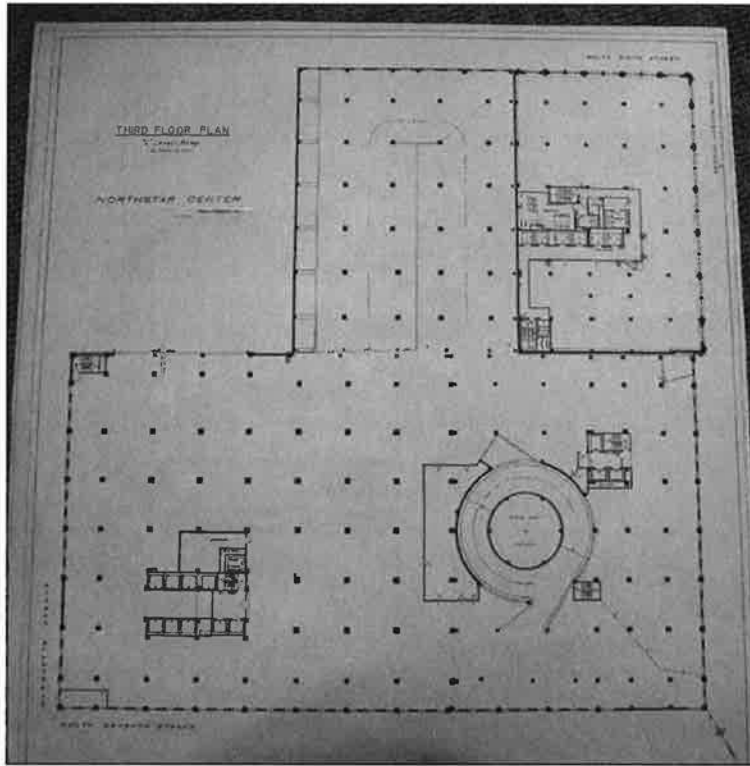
As-built drawing of the third floor, showing typical floor plans for the third through sixth floors of the Northstar Center, which is primarily the parking structure. The Pillsbury Building is in the upper right.
